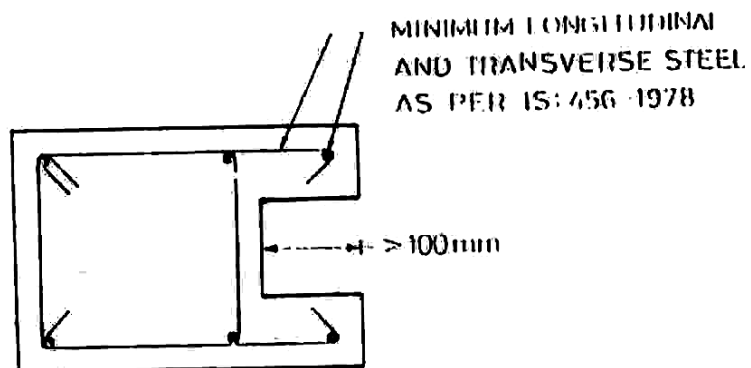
REINFORCEMENT REQUIREMENT FOR COLUMN WITH MORE THAN 100 mm PROJECTION BEYOND CORE
